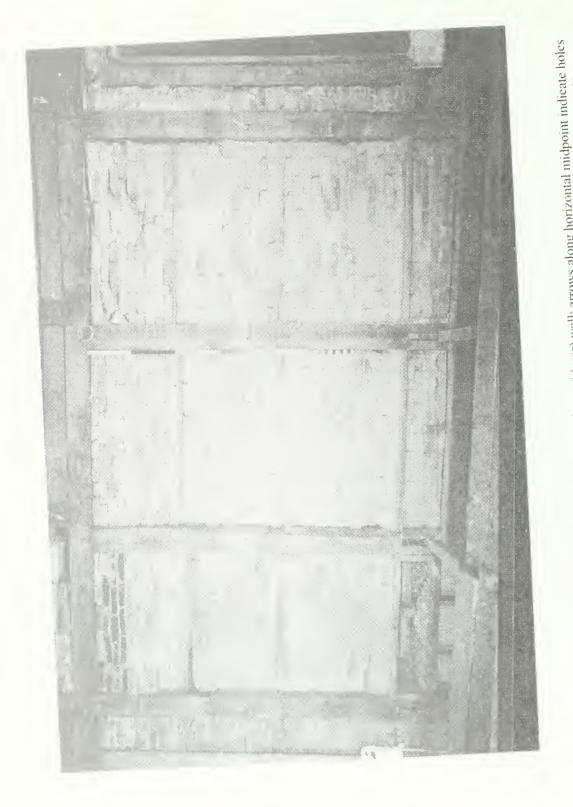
Schuyler House: Exposed framing of exterior east (rear) wall; arrows along horizontal midpoint indicate holes from wrought nails that held rafter eleats for shed roof of 1787 Father's Office and porches (November 1959).
